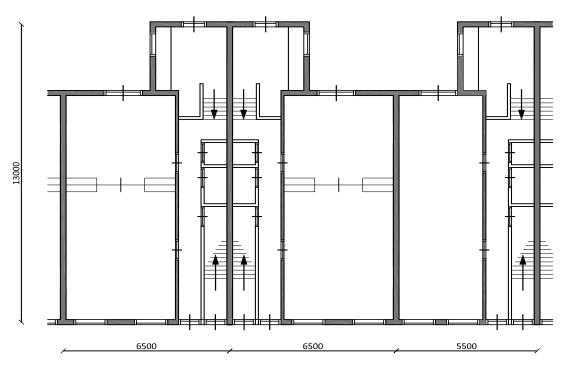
Ground floor plan Marthinus Steynstraat 29-39 (by author).
